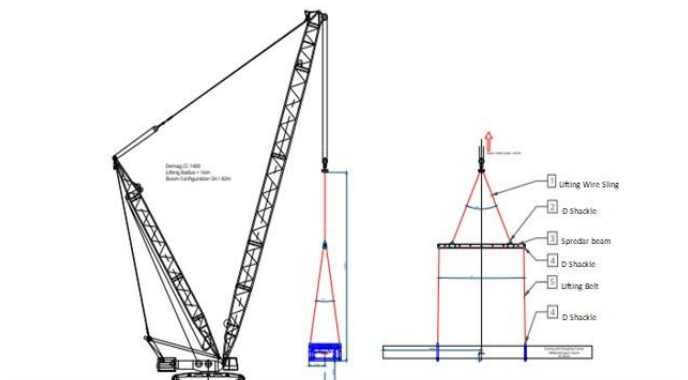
Lifting drawing for a lifting of 45-ton ODC cargo [6]
